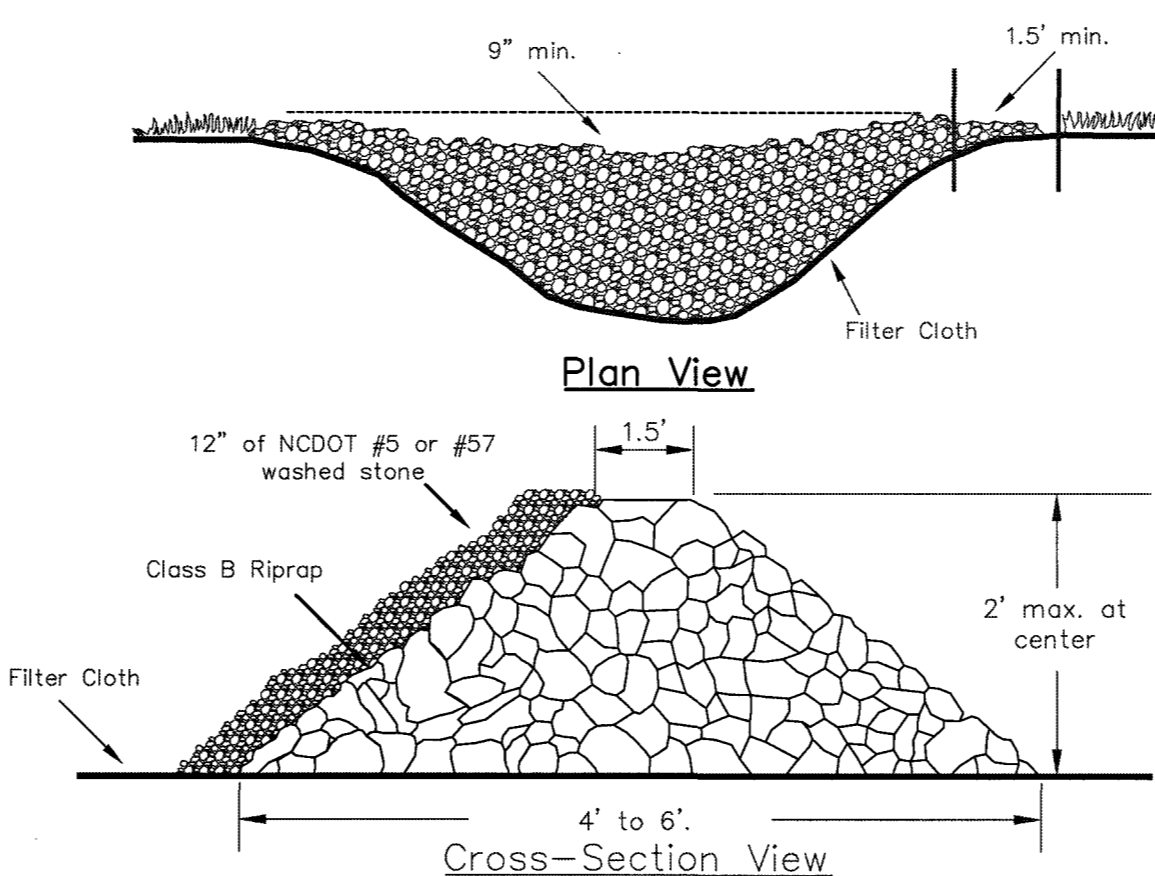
Stone check dam stone should be placed over the channel banks to keep water from cutting around the dam.
